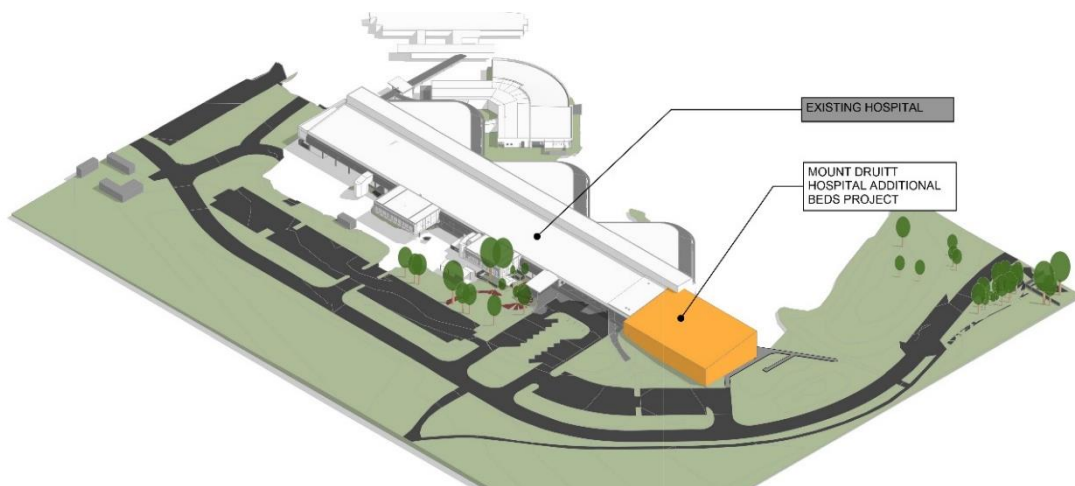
MDH Southeast Isometric - Proposed Building Massing
